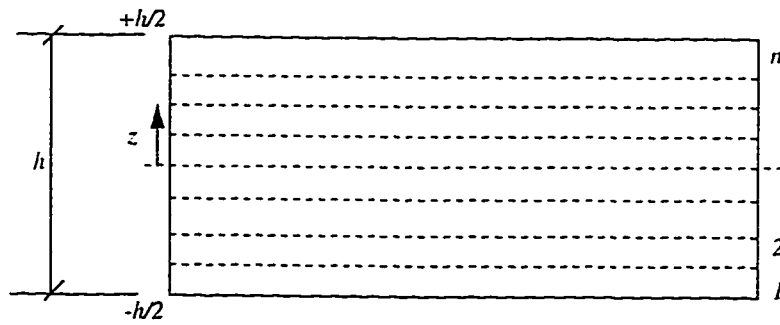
Layered Element Model for Reinforced Concrete Slab.
